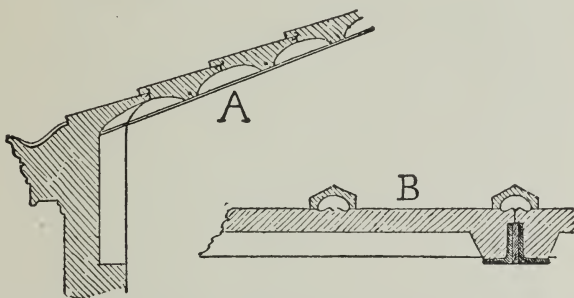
Roof Construction of Dome Shown in Fig. 490.
